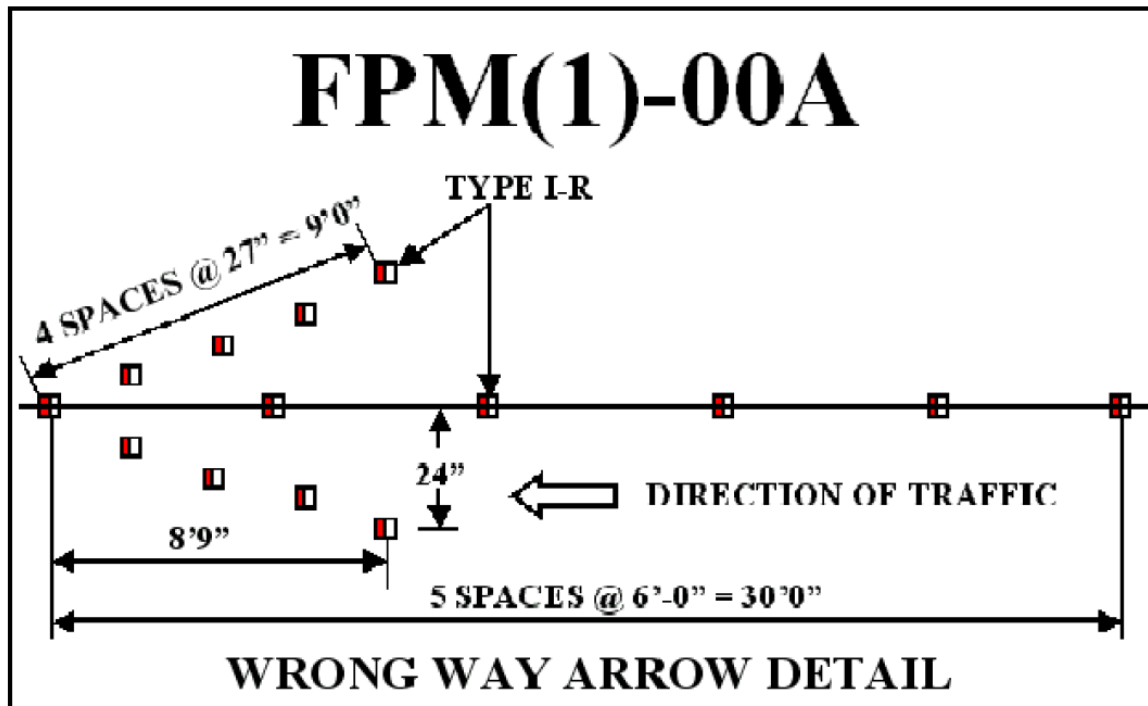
TxDOT Wrong-Way Pavement Arrow Detail (22).
